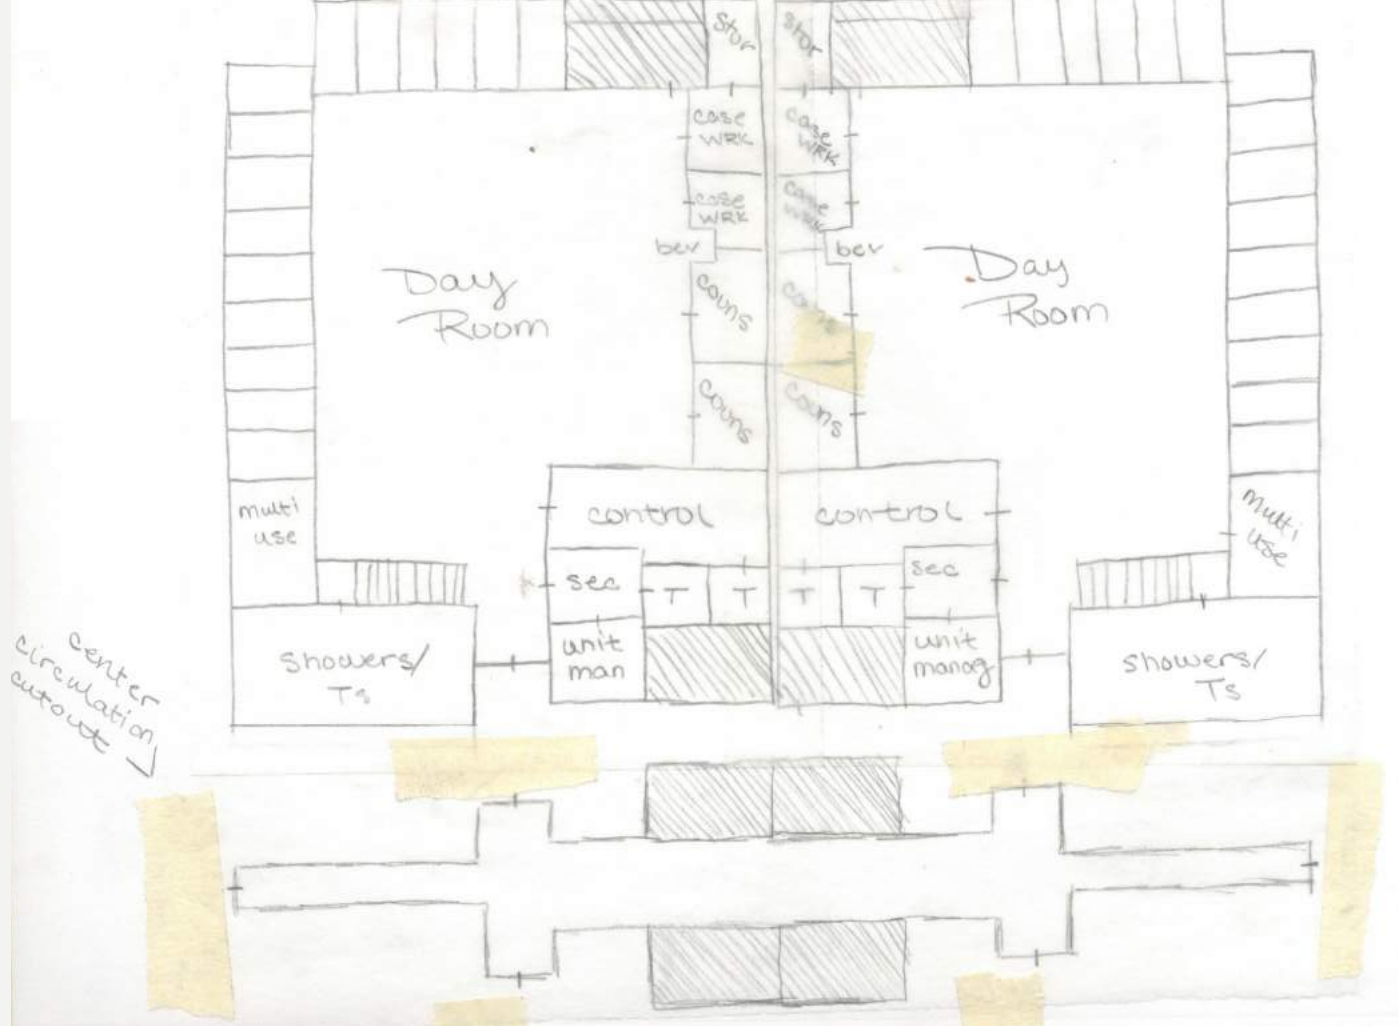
Level 2 General Housing Portion Sketchbook Plan
